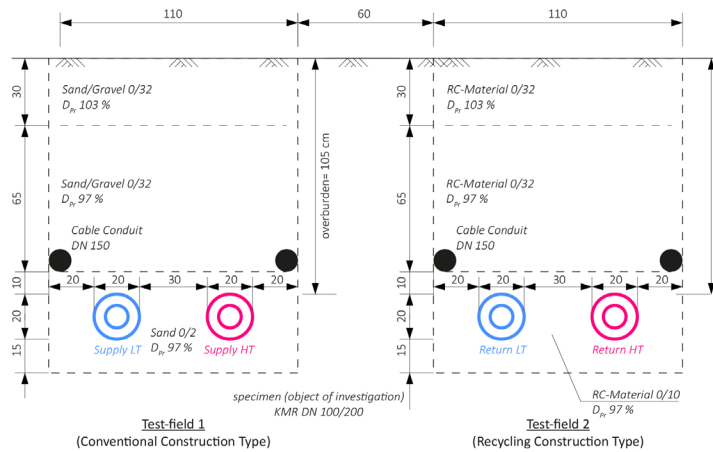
Cross-section of PTB with DN 100 bonded pipes (Detailed-Design)
